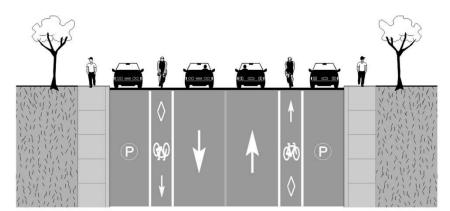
Typical Bike Lanes Adjacent to On-street Parking (Source: Halton Hills Cycling Master Plan Final Report)
